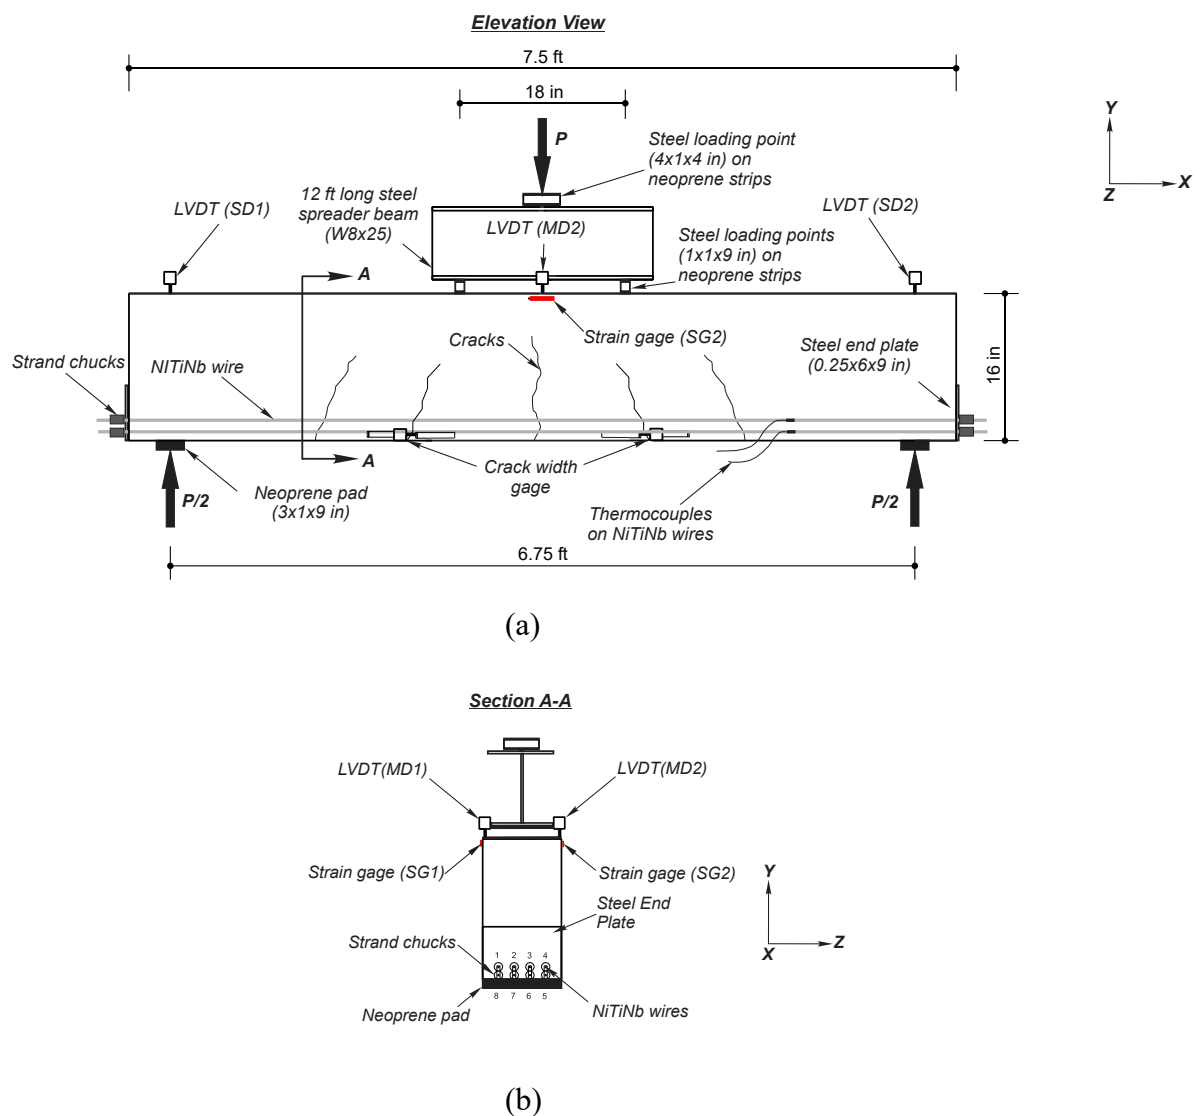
Instrumentation of reinforced concrete girders: (a) elevation view; and (b) cross-section view.
